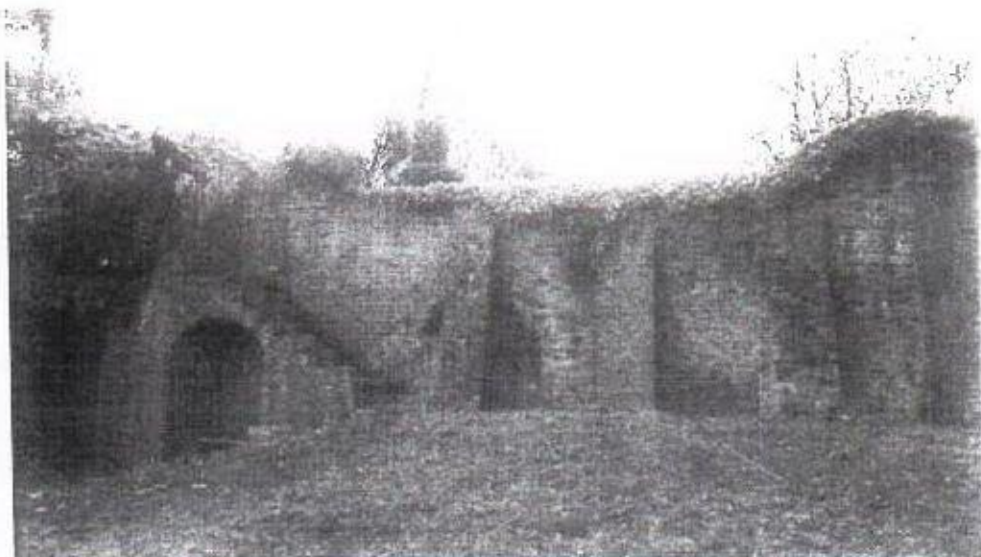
NORTH WEST BOUNDARY WALL 32
